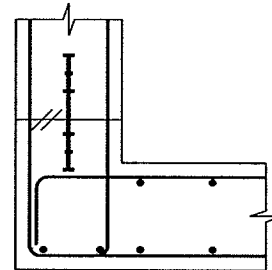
Joint profile in construction joint with through-goint reinforcement in the topside of the slab.
